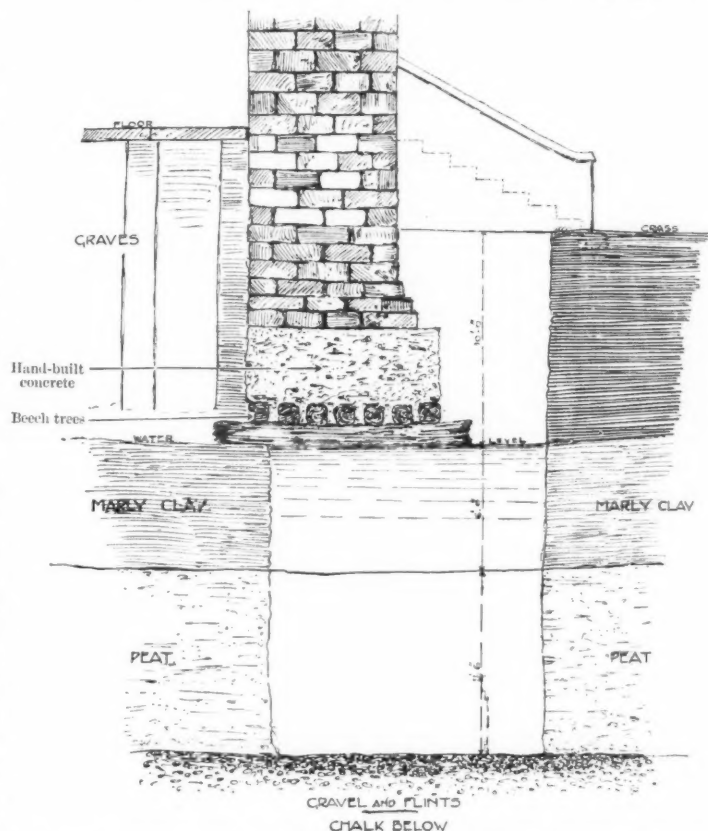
WINCHESTER CATHEDRAL: SECTION THROUGH WALL OF PRESBYTERY SHOWING BEECHWOOD UNDER THE FOUNDATIONS AND RELATIVE POSITIONS OF MARLY CLAY, PEAT BED, AND GRAVEL.
